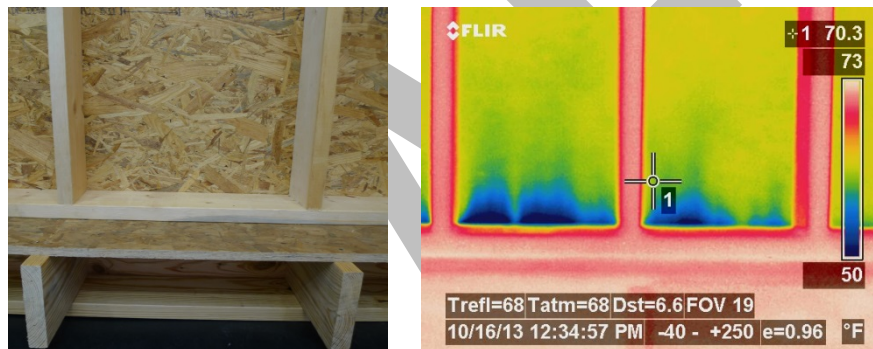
Interior side of wall-to-foundation joint (left) and corresponding infrared image (right) showing cold air infiltrating through the interface between the oriented strand board sheathing and the bottom plate [29]. The image shows a test wall that did not have an air barrier and was subjected to a pressure and temperature differential in a test chamber. (Source: ORNL)
